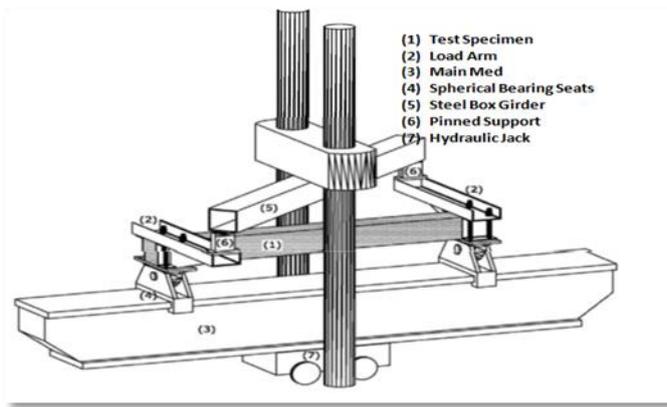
Suggestions of load Arrangement Showing the Test Rig⁽¹³⁾ Figure (4): Arrangement of Beam Testing
